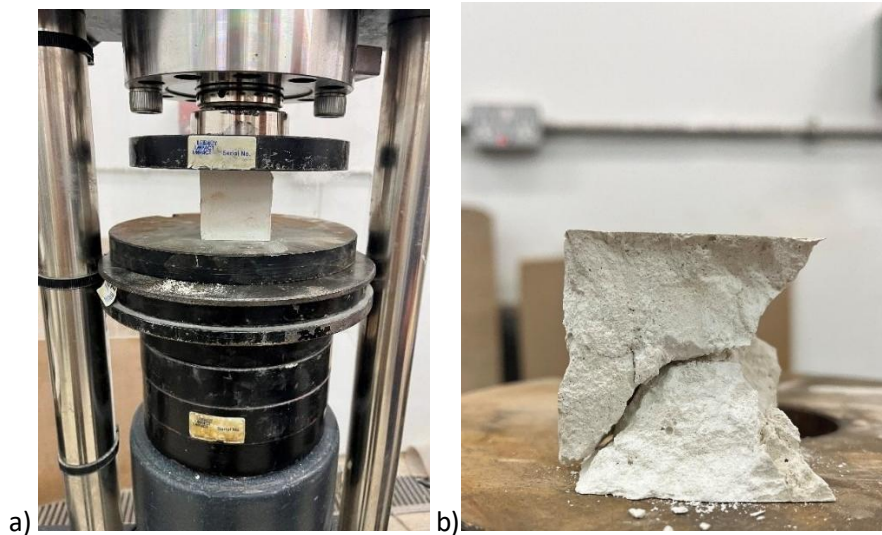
a) A photo of the 50x50mm plaster specimen under the compression machine. b) A photo of the shear failure which the plaster specimen went under the compression machine
